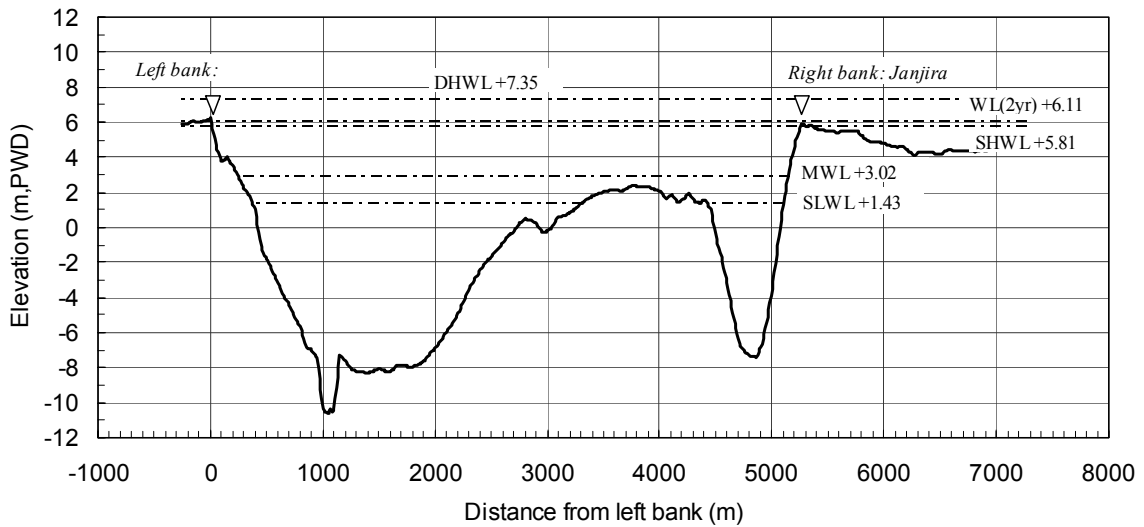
Cross-Section of Padma River at Crossing Route
